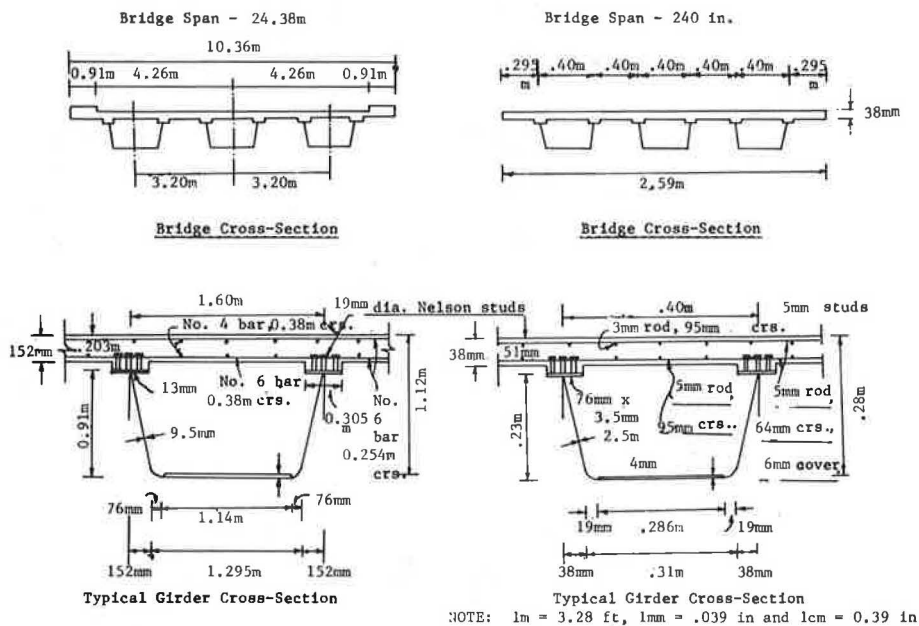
Typical composite box-girder bridge with prototype and model dimensions.
